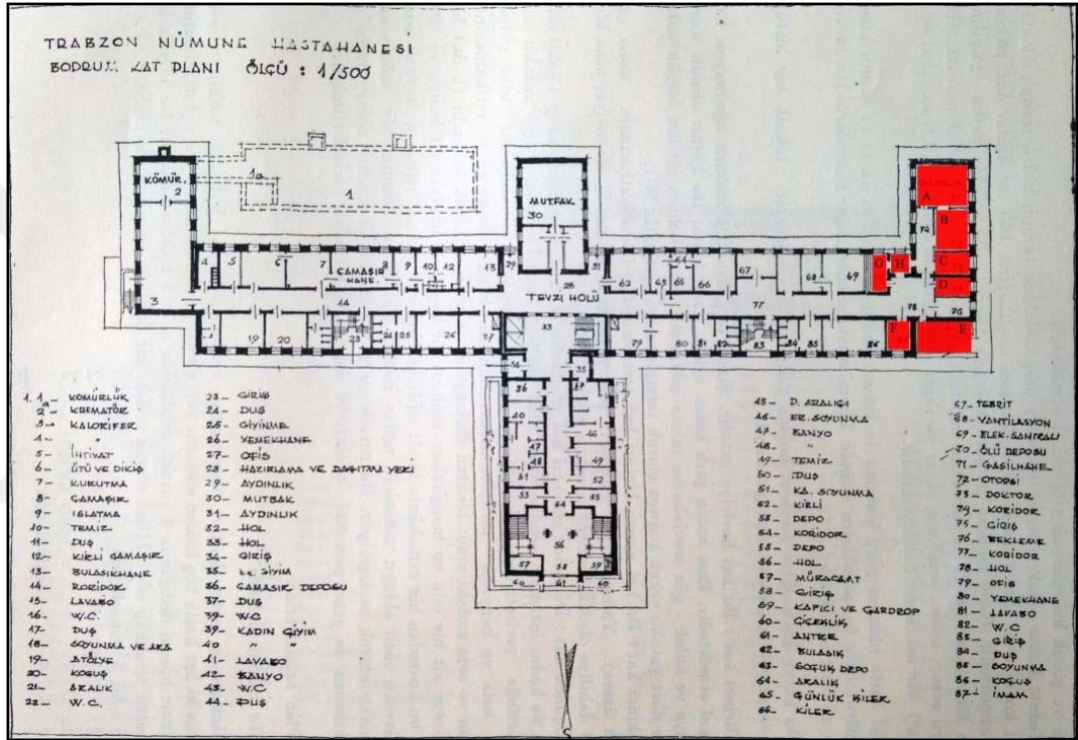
Basement Floor Plan of Trabzon Nümune Hospital (Bolak, 1950, 95)
